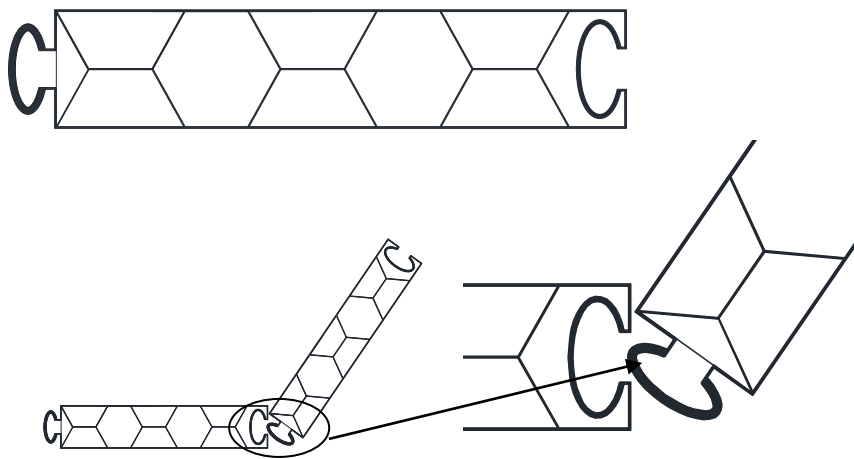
Bar-and-slot deck-to-deck panel connection
